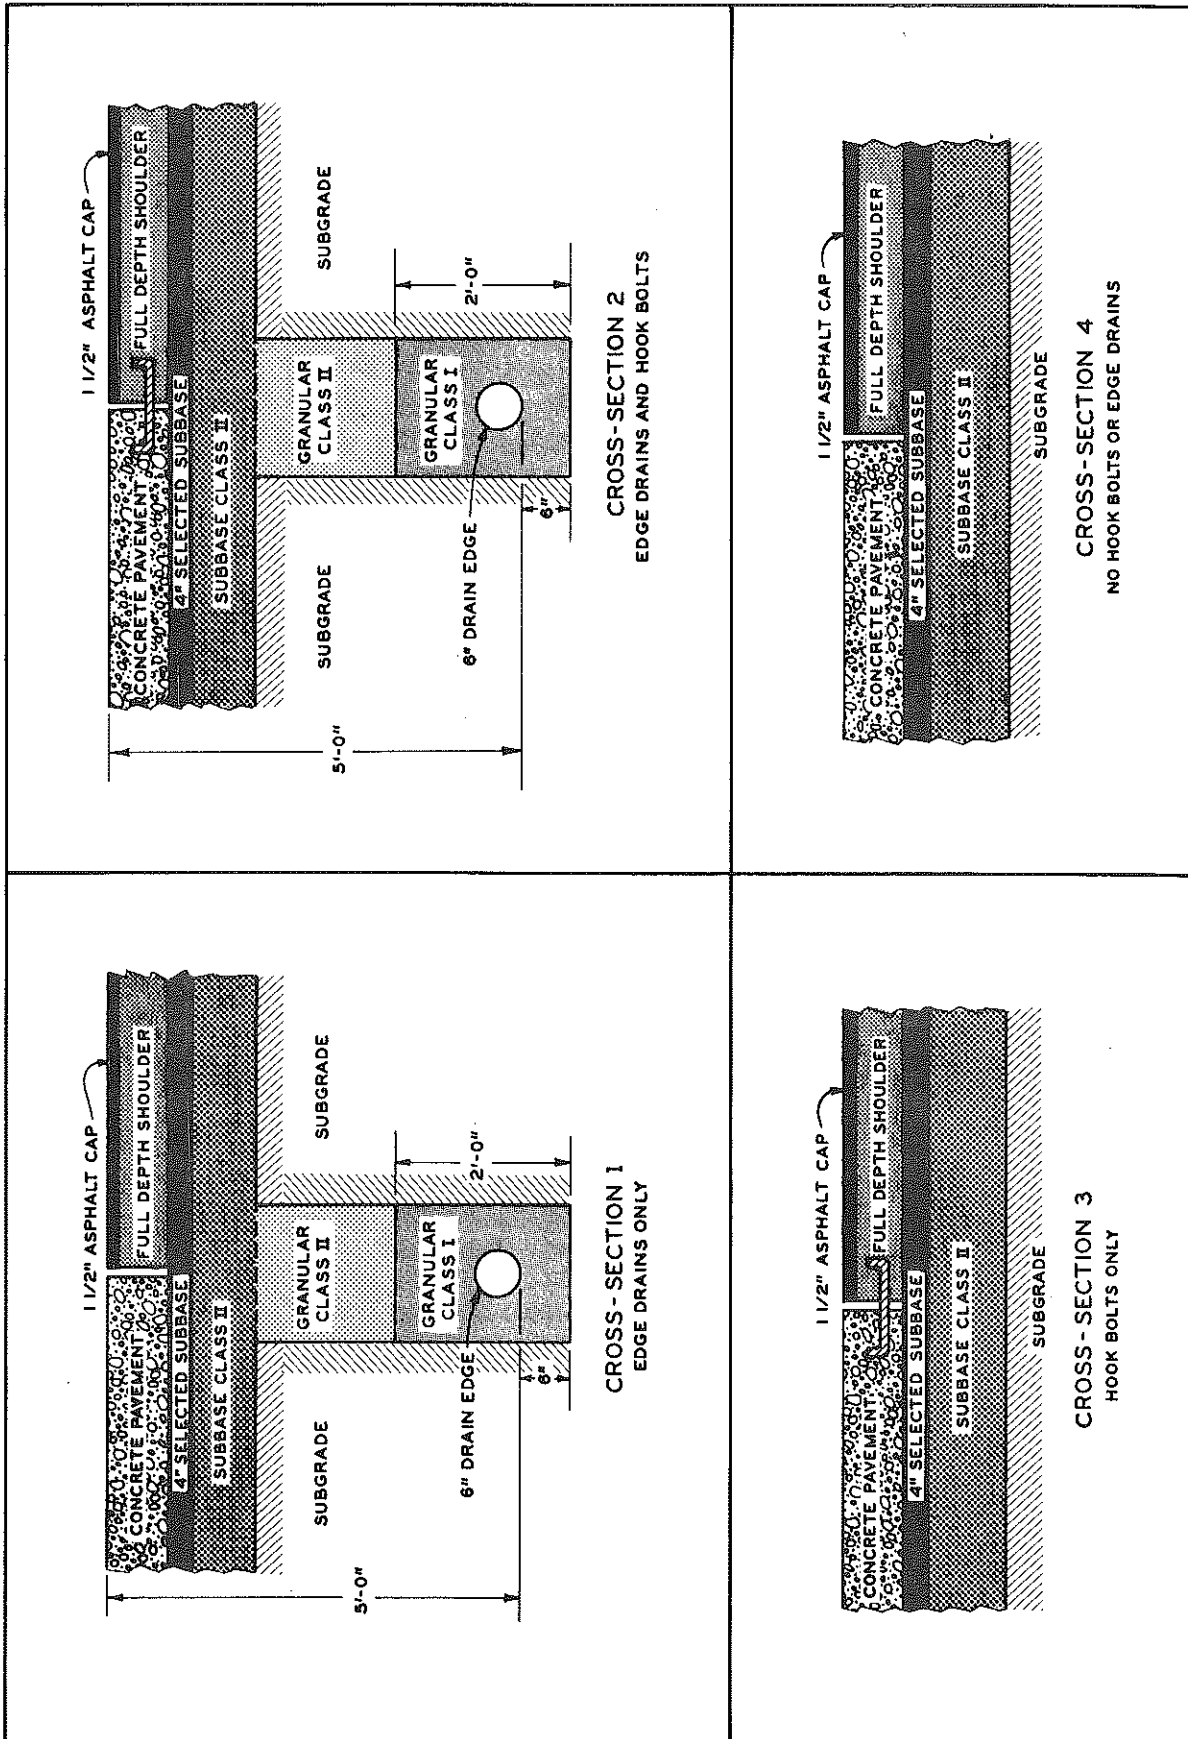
Cross-sections showing edge drain and hook bolt layouts.
